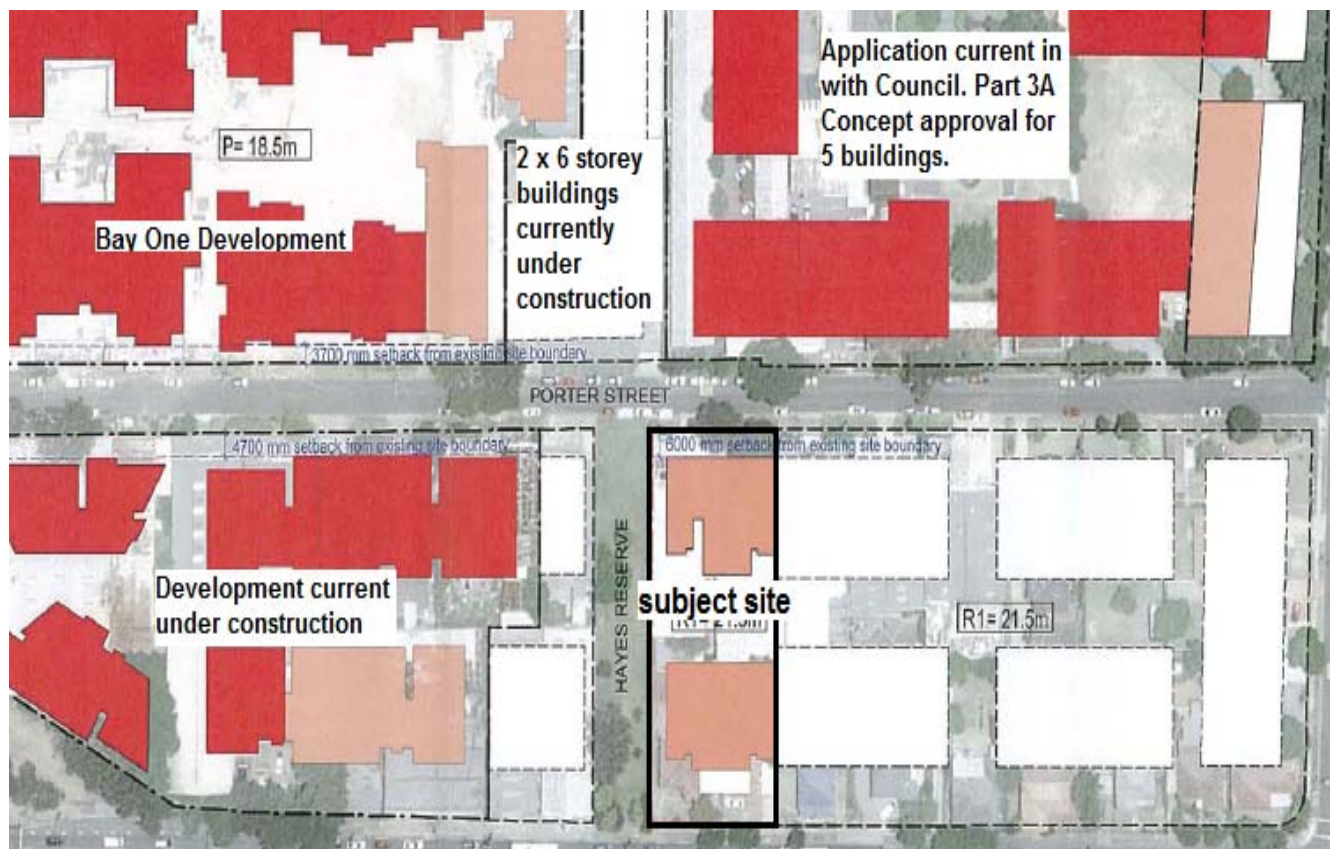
The proposed two buildings on the subject site with surrounding properties with existing buildings or future buildings which has been approved.
